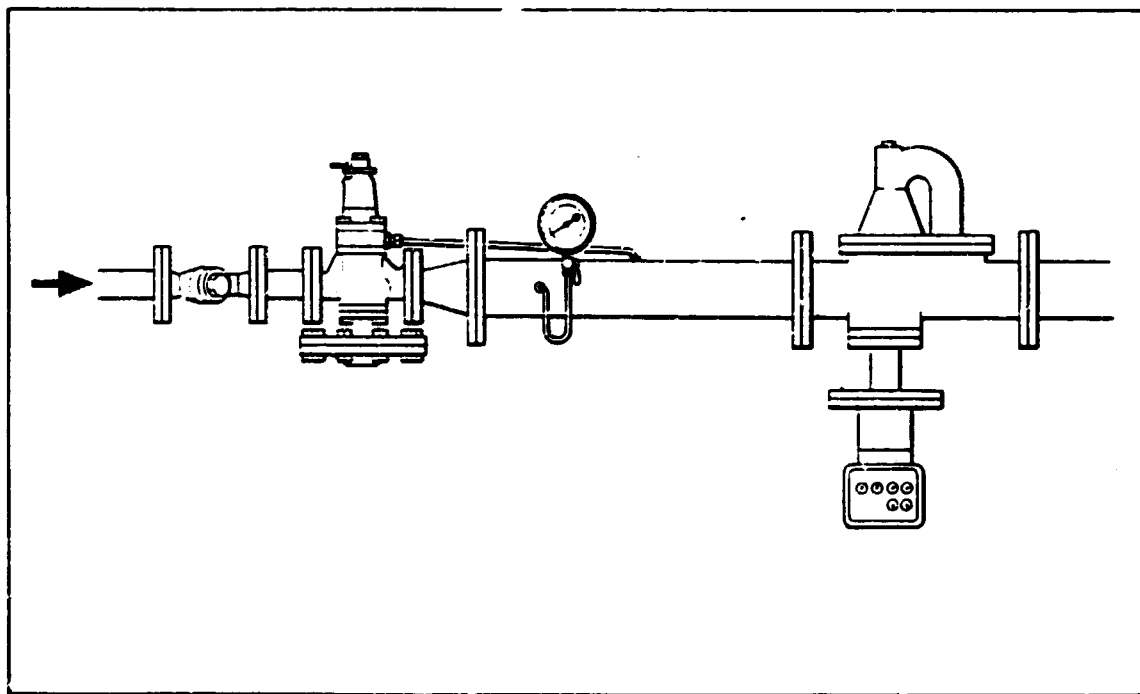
Integrating Steam Meter Installed after the Reducing Valve
